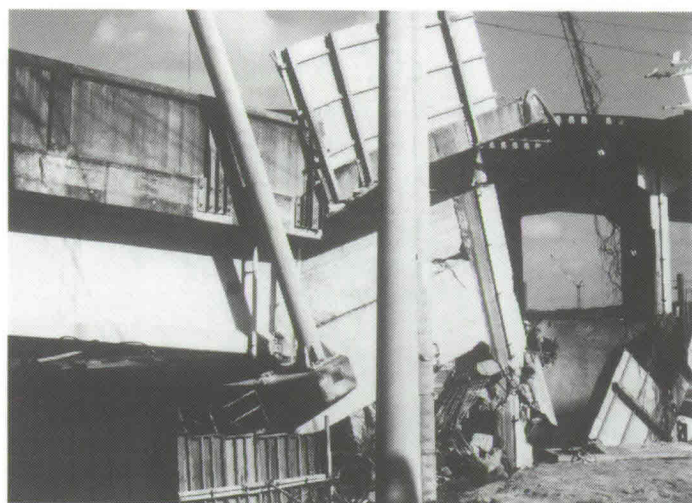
Failure of rigid-frame abutments (Ikawa River Bridge, Sanyo Bullet Train Line); upper and middle girders in contact after destruction of the upper-deck side columns
